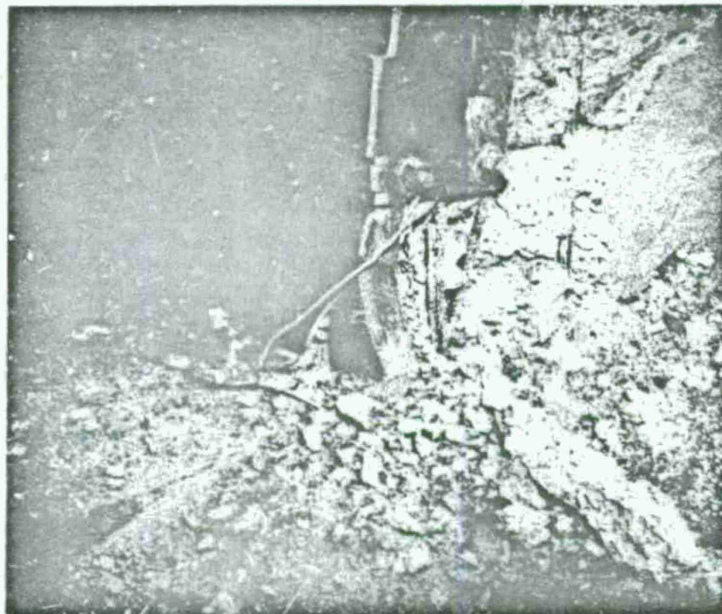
Hinge Plate and Bottom of Door Jamb on Igloo C Showing Method of Failure.
